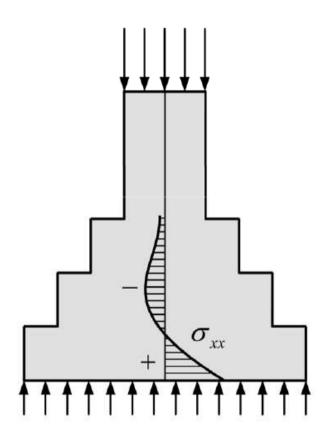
Foundation foot. Stresses and strut-and-tie scheme.
